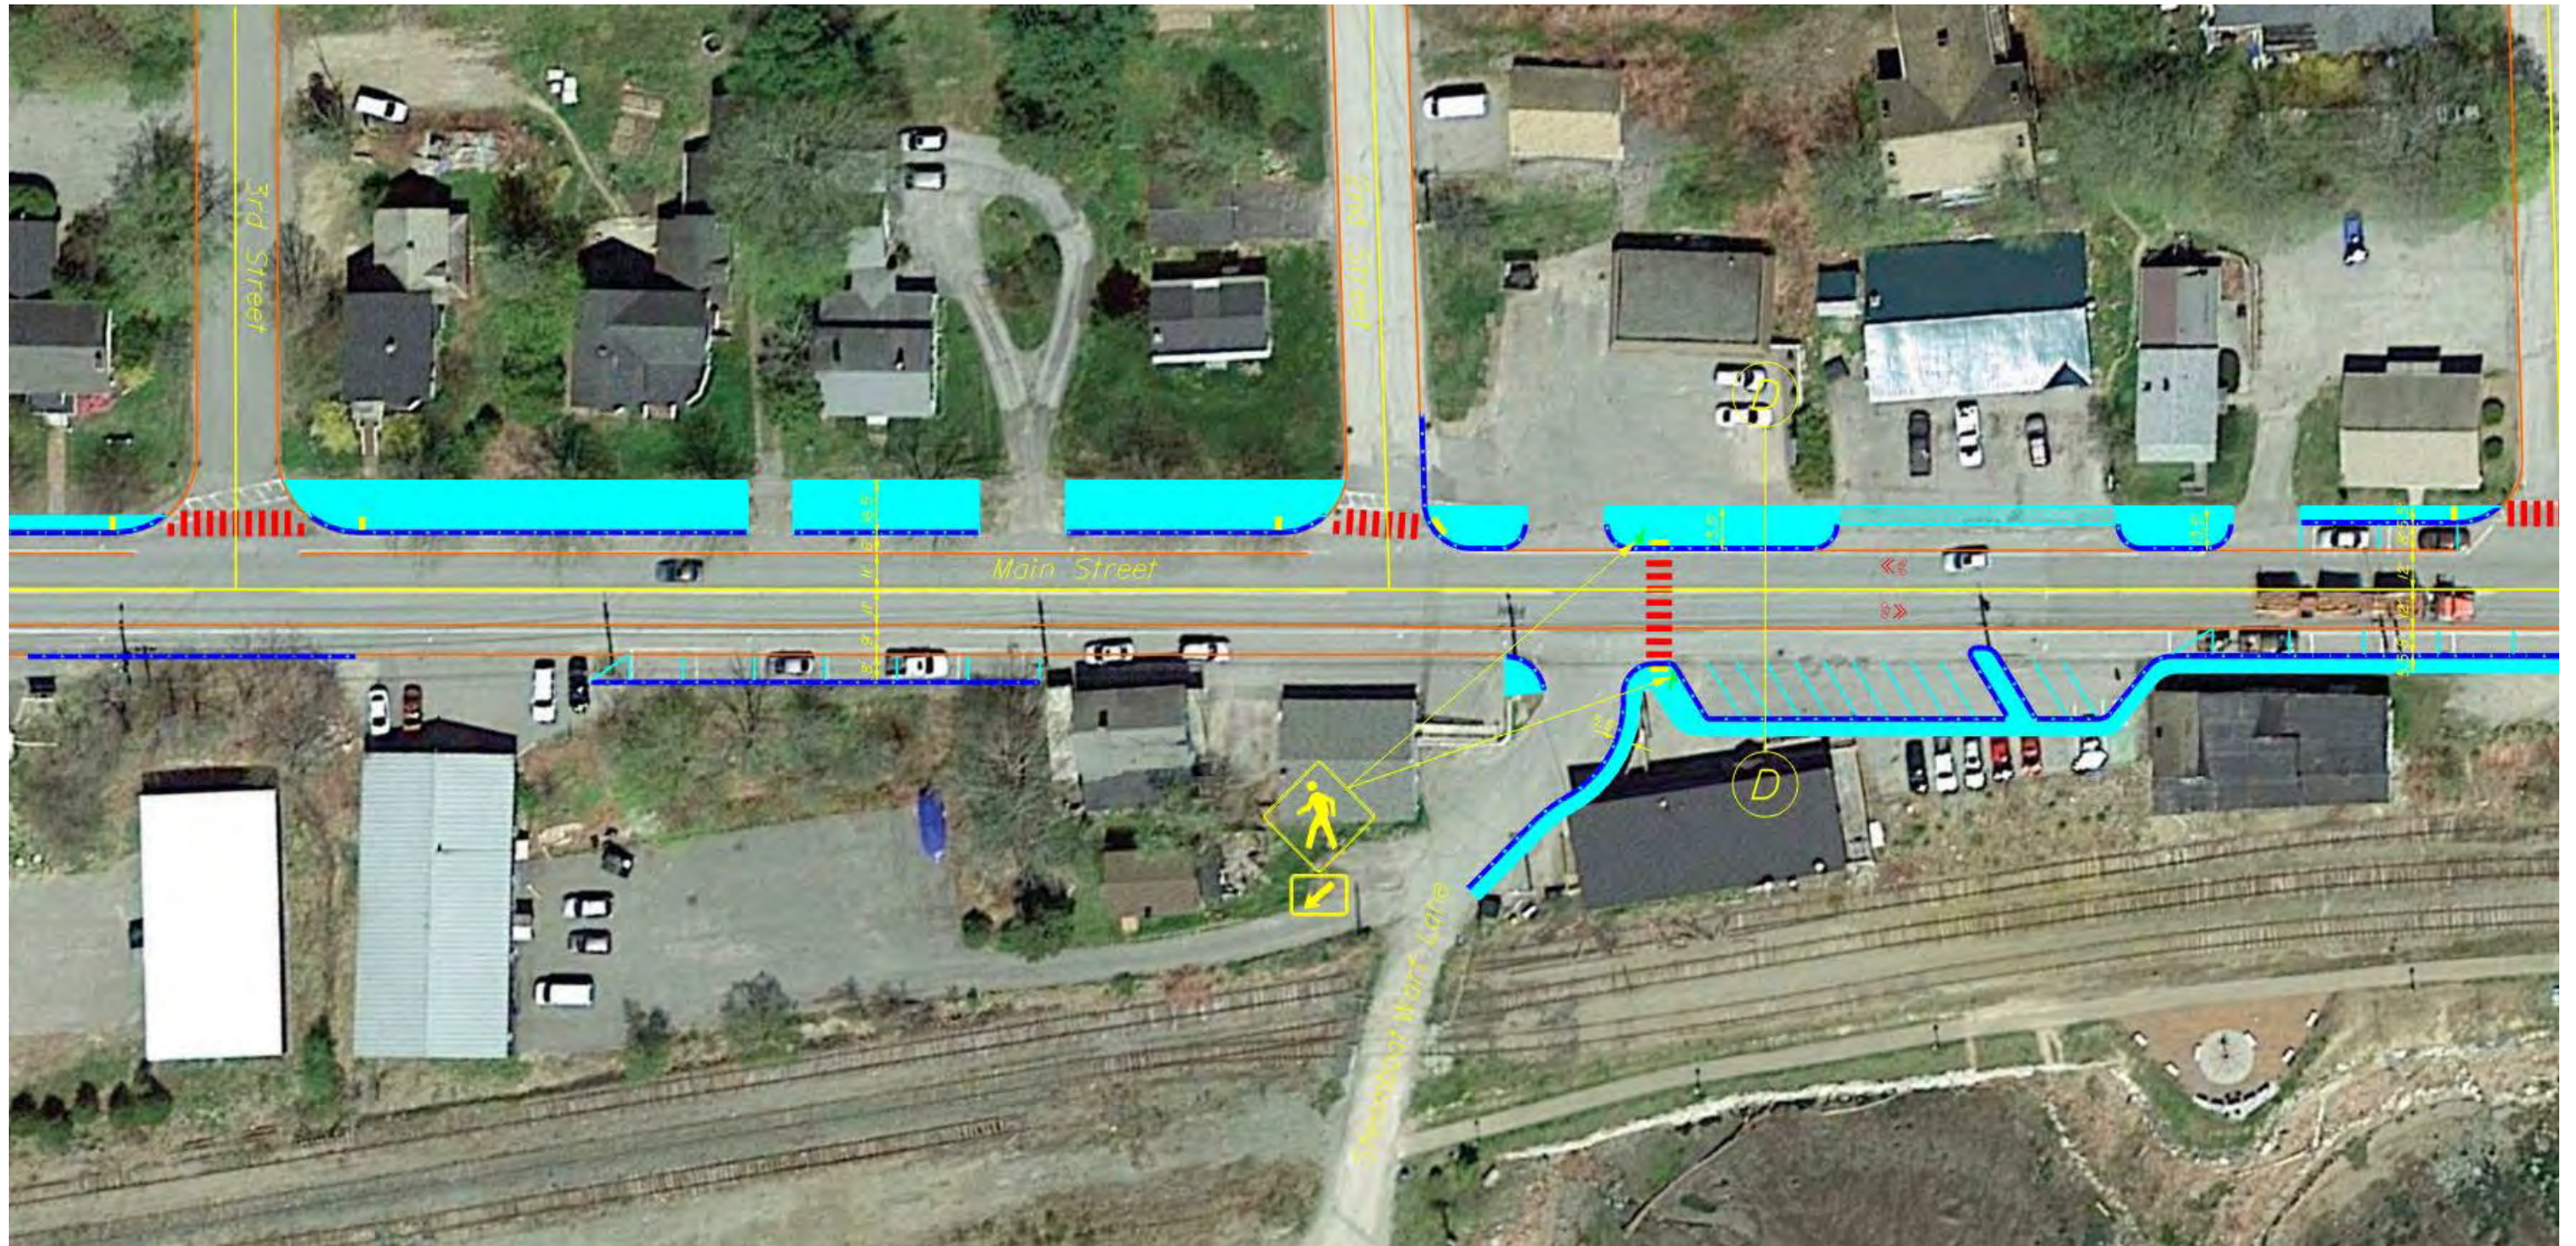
Main Street Improvements from 1st Street to 3rd Street
